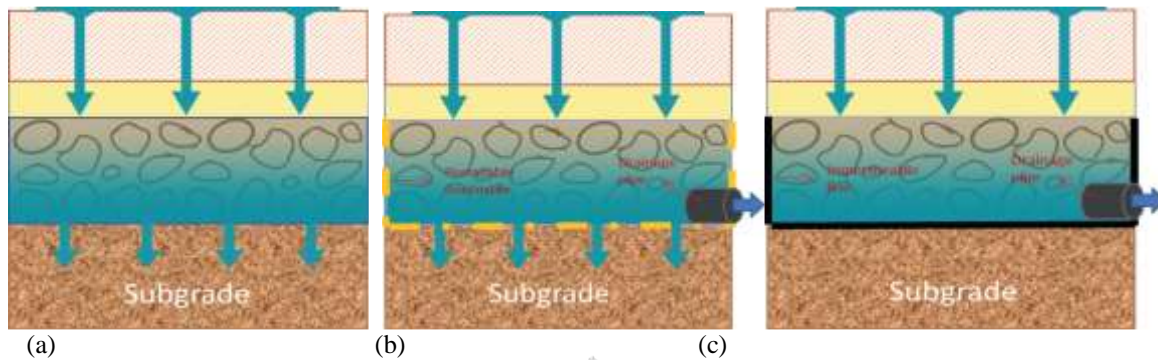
Typical permeable pavement sections: (a) fully permeable pavement, where water can infiltrate to subgrade; (b) half permeable pavement, with some water infiltrating to the subgrade, most is stored in the pavement structure; (c) permeable pavement with no water infiltrating to the subgrade but is stored in the pavement structures[8].
